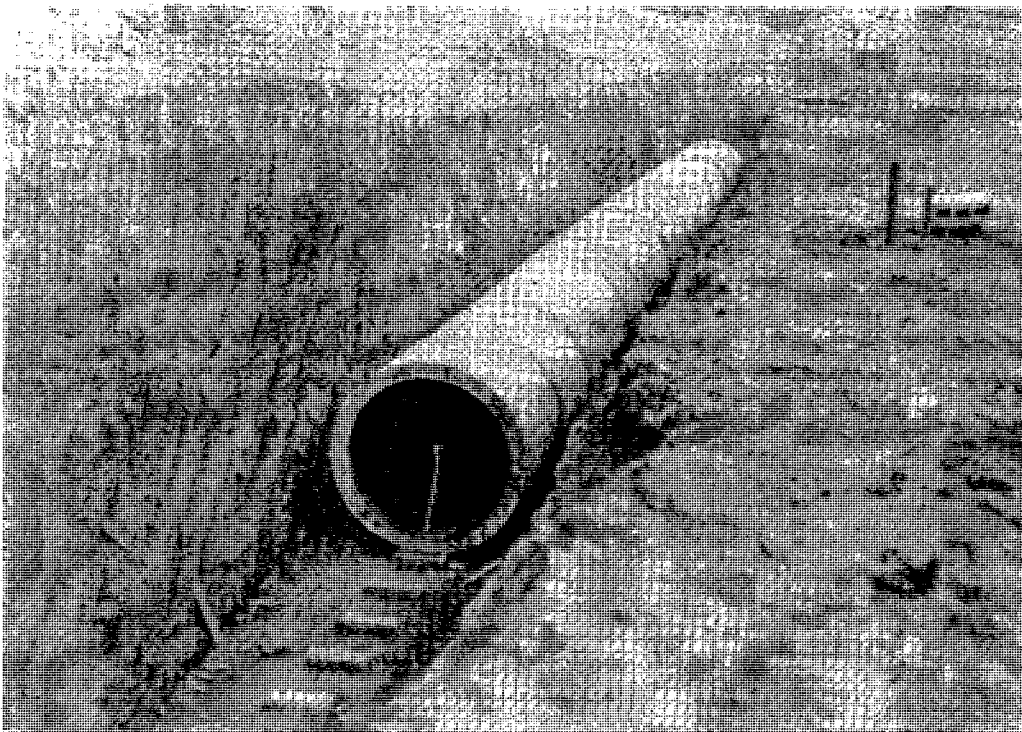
Sewer of R.C. pipes shown in Fig. 20.
